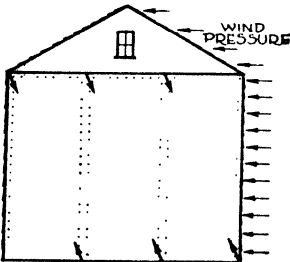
Insulation Board Sheathing under Diagonal Tension. Same as Steel Straps in Fig. 16; Building Not Distorted
